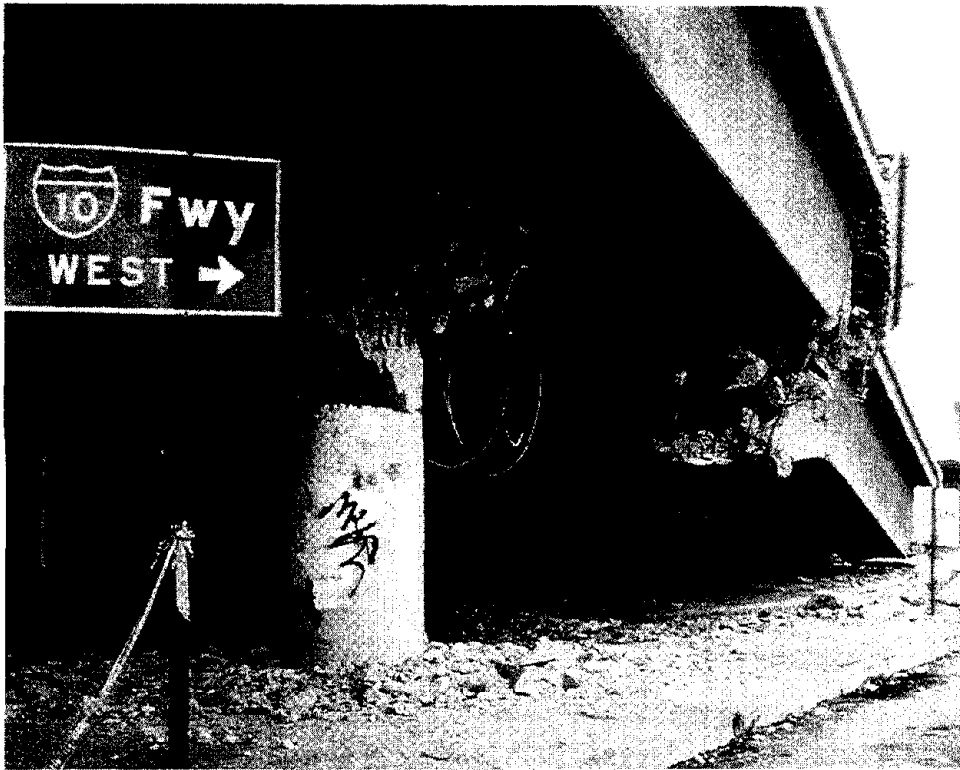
Collapsed westbound lane of I10 at Venice Blvd.; pier of Bent 7 in foreground
